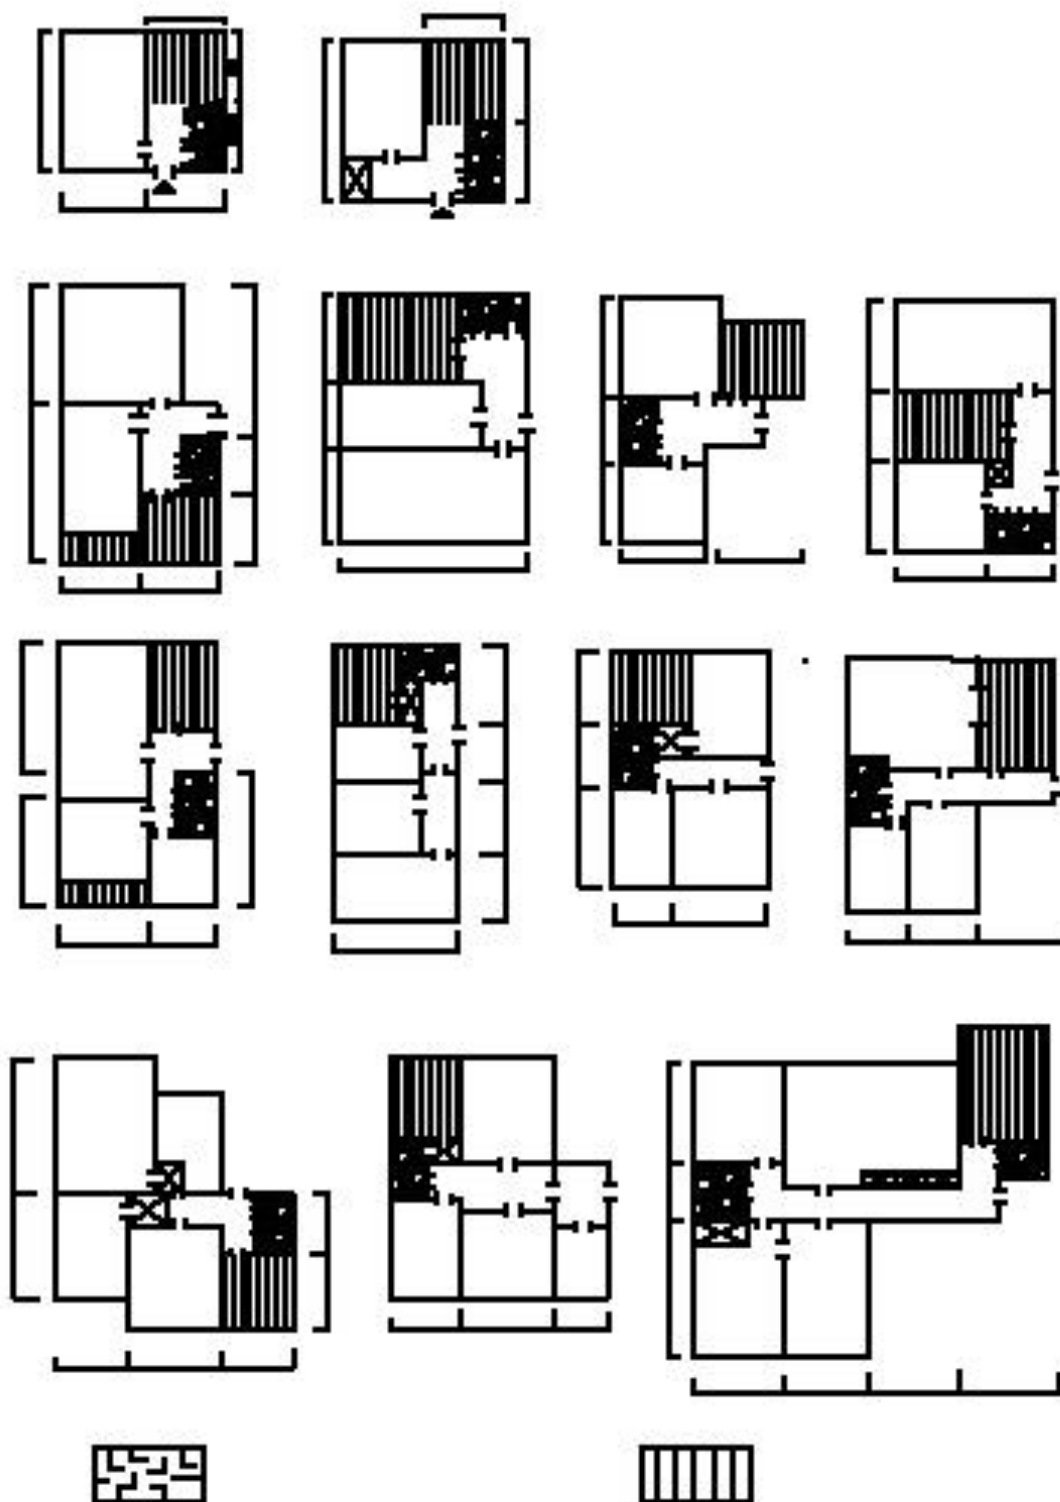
Schemes of basic apartment types in sectional buildings
